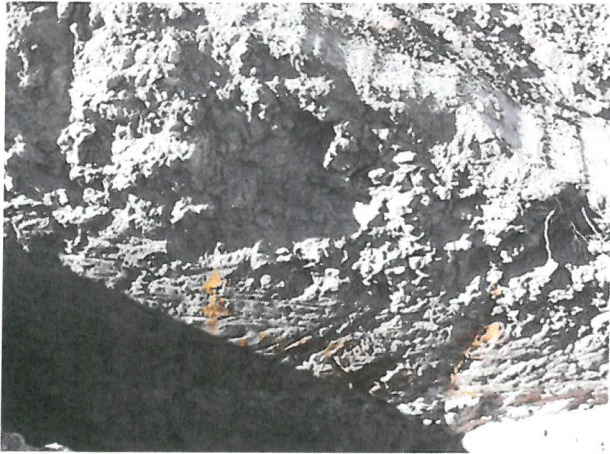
A5-5 – T-14 close up of crack in southeast wall.
